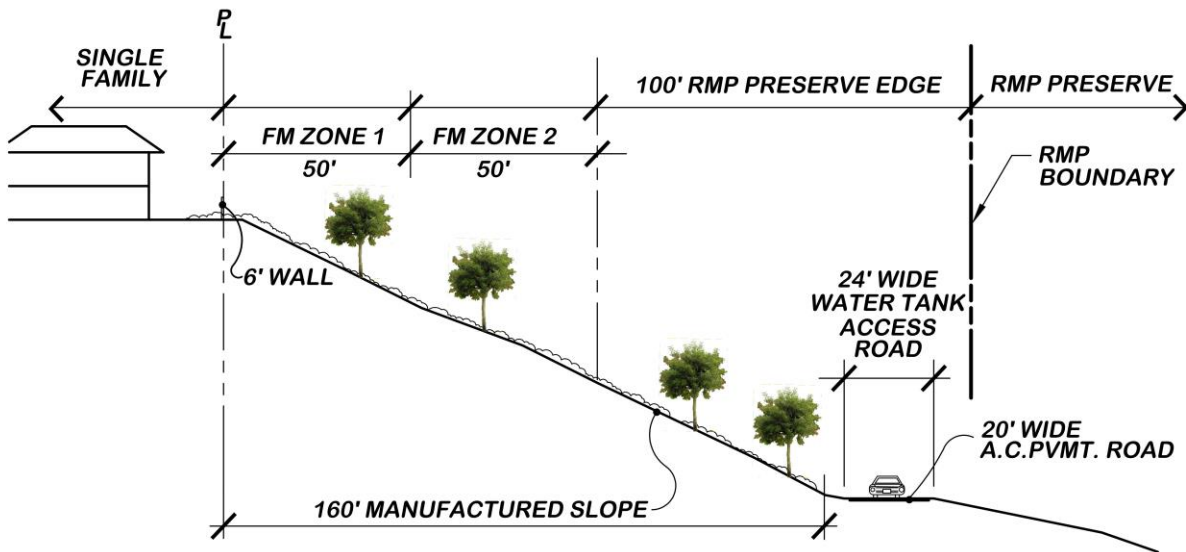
Typical Condition 1 – Perimeter Slope & Access Road @ Single Family R-15
